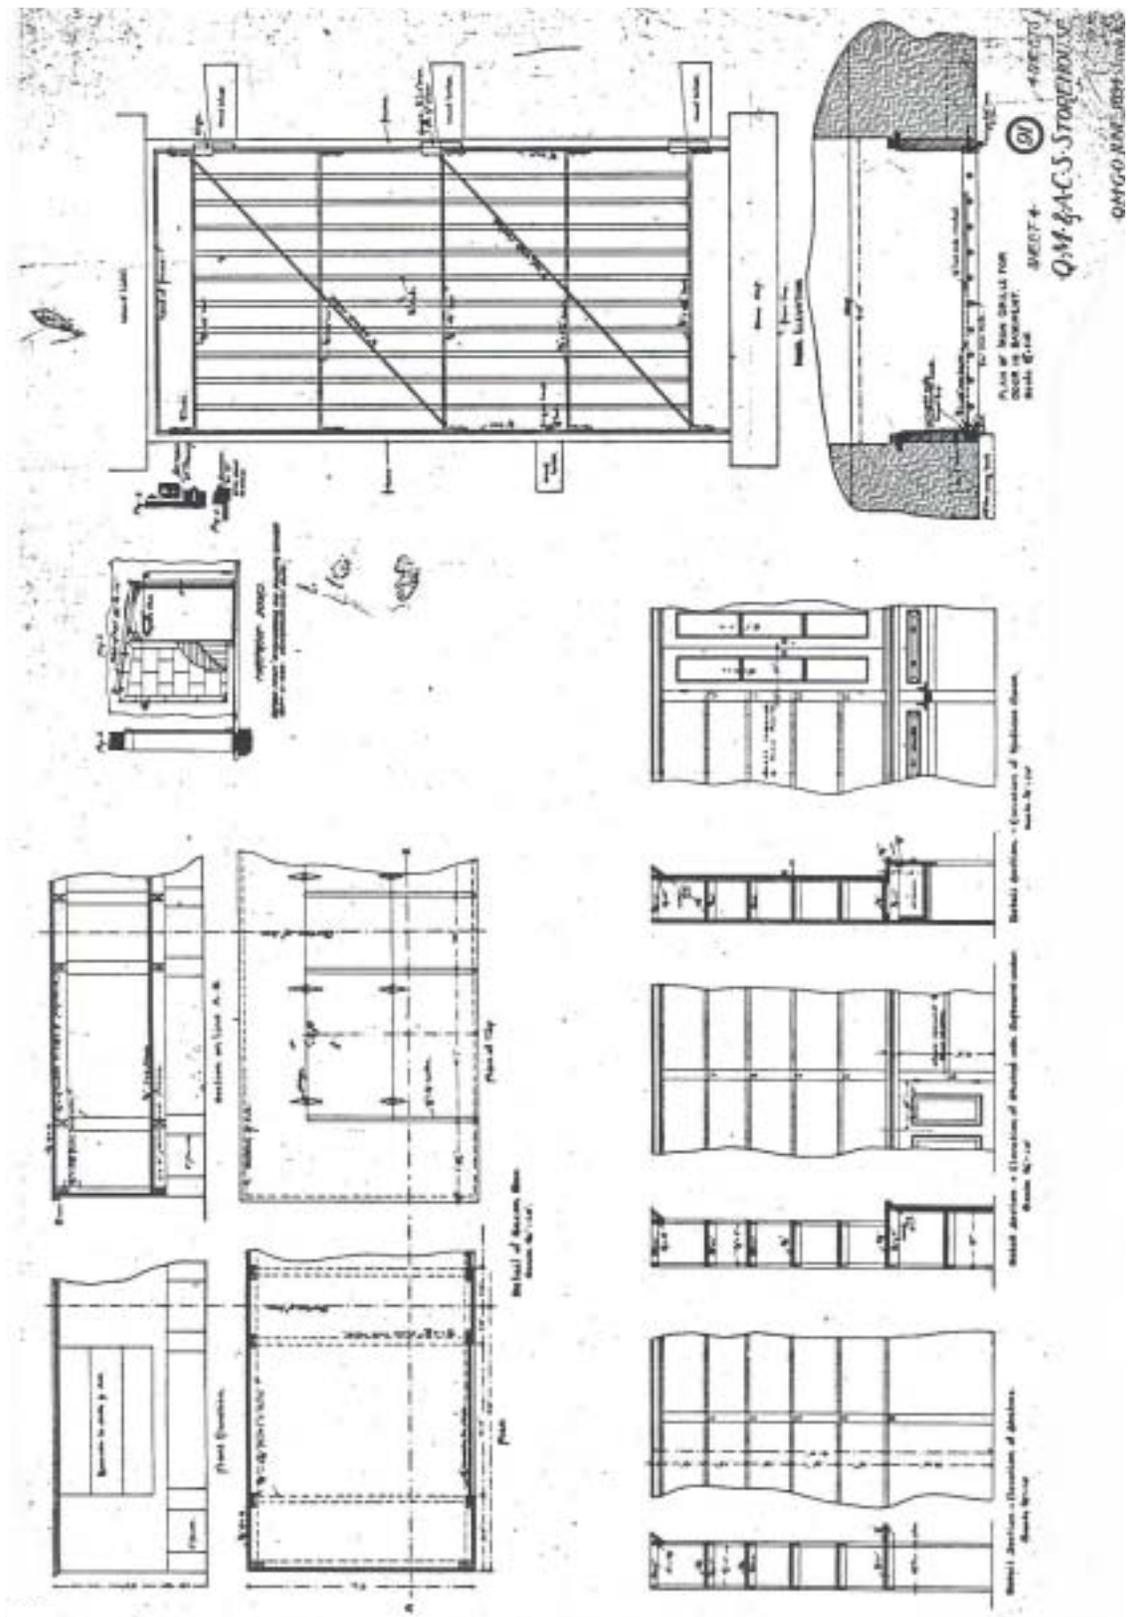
Details, Quartersmaster and Subsistence Storehouse, Plan no. 91, June 1894 [sheet 4 of 4].
